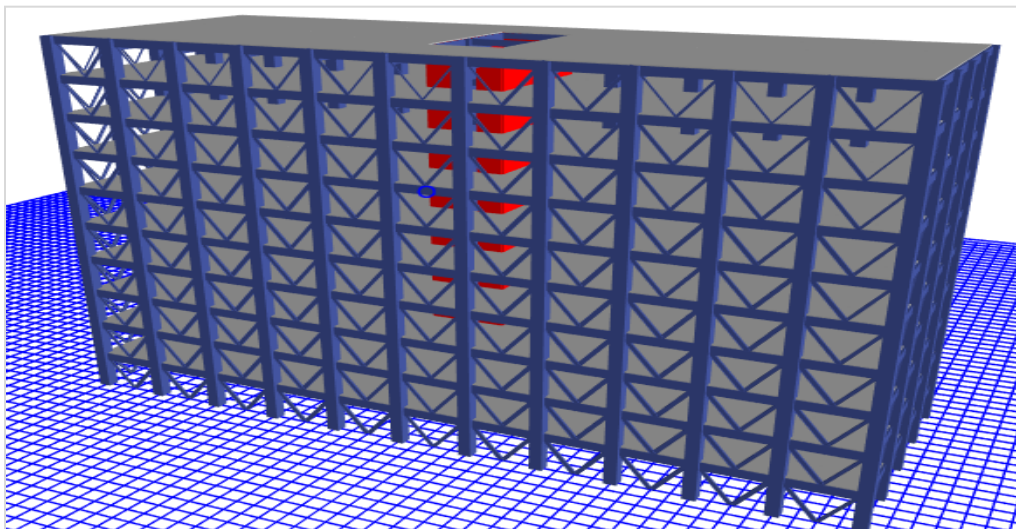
3D View of structural skeleton of framed tube structure with V bracings
